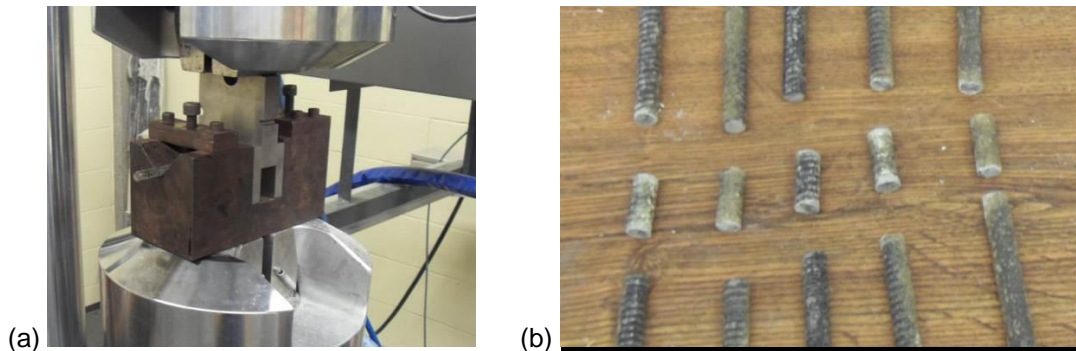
Transverse shear strength test: (a) Test setup; (b) Typical shear failure
